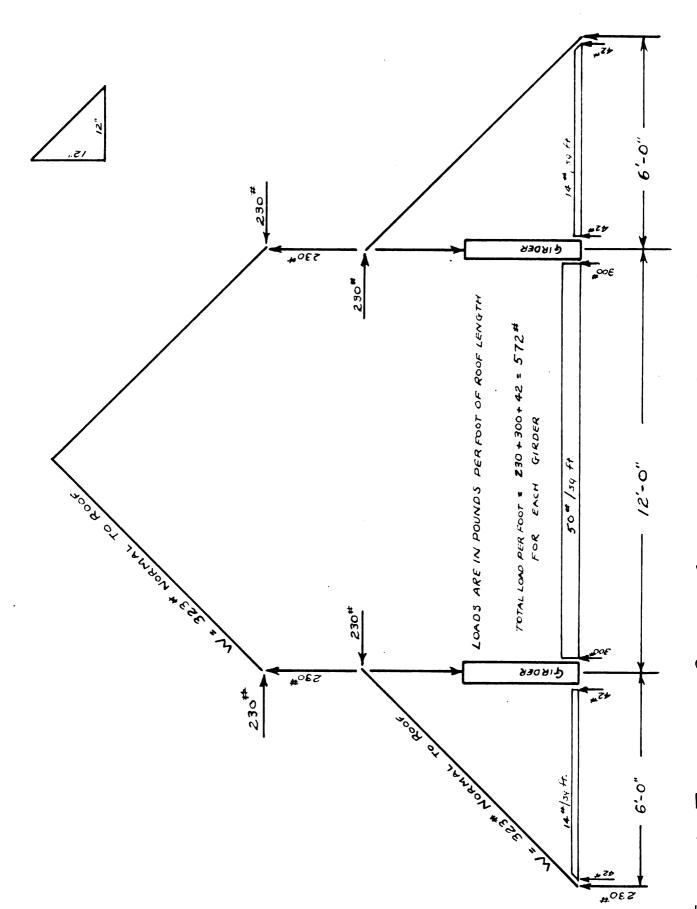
TRANSVERSE SECTION SHOWING LOADS CARRIED BY GIRDERS
